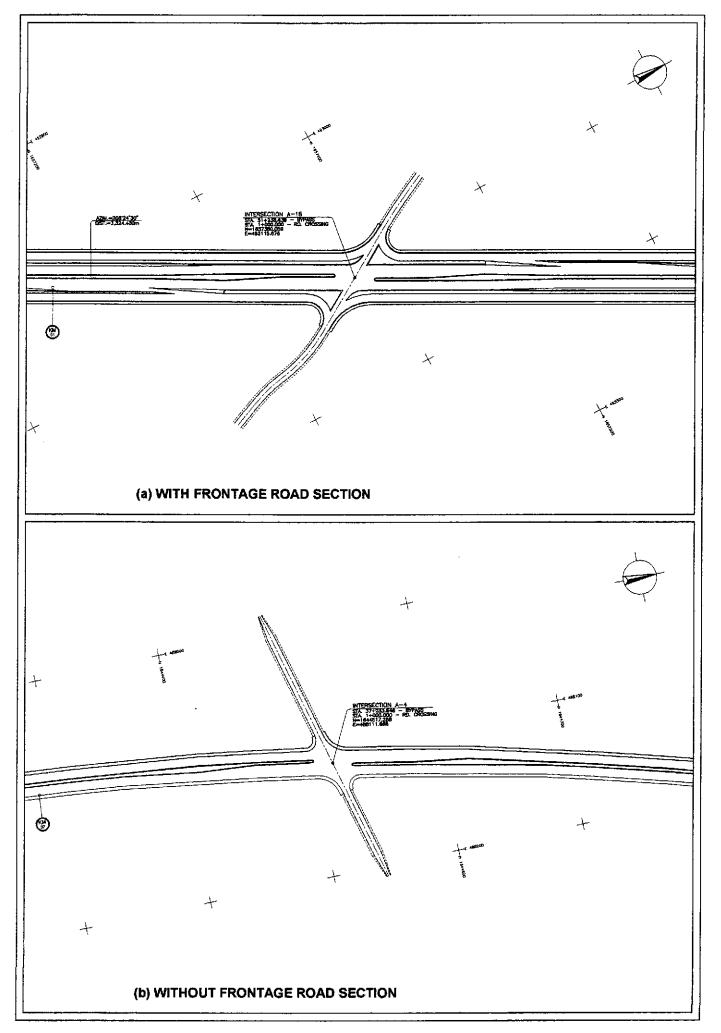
TYPICAL MINOR INTERSECTIONS OF PLARIDEL BYPASS
